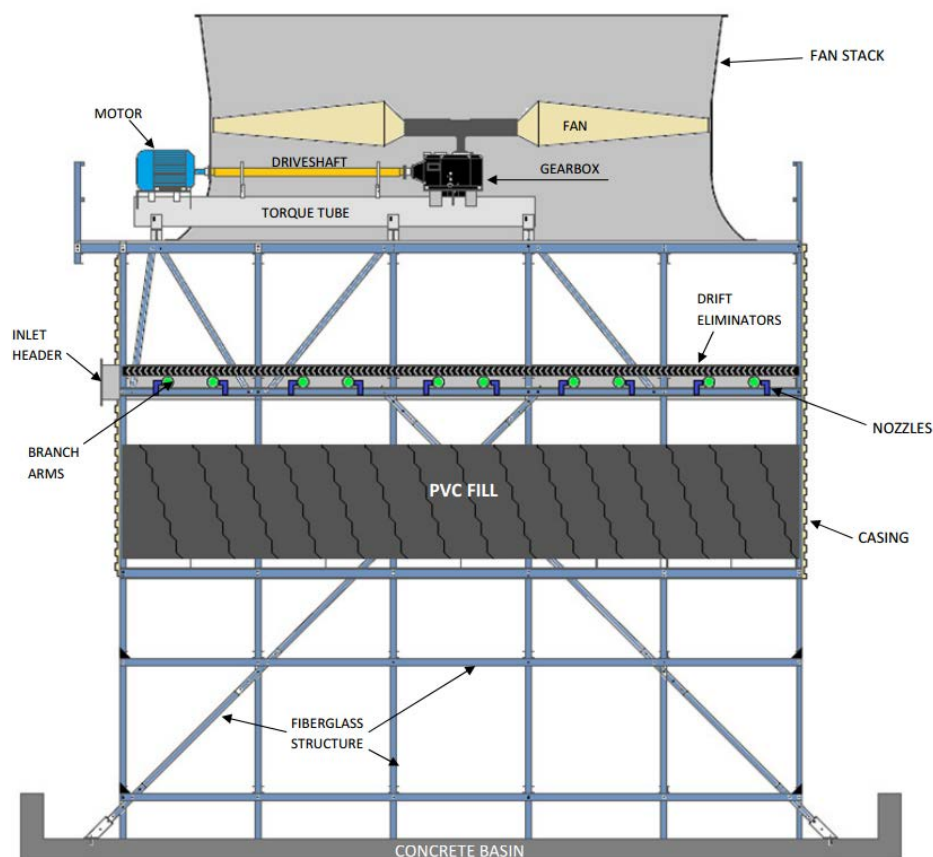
Cross-section View of a Typical Counterflow Mechanical Draft Cooling Tower, Image Courtesy of EvapTech
